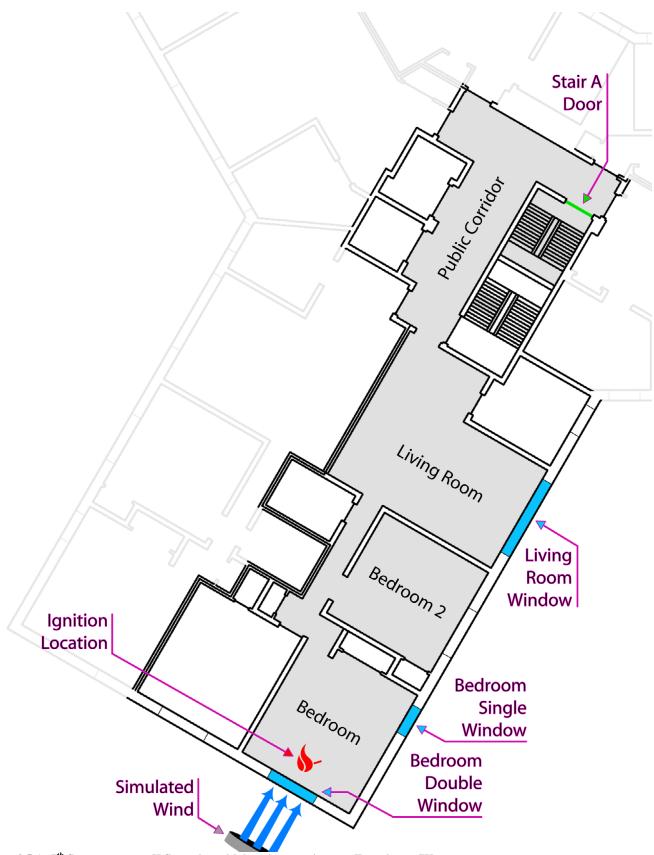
7<sup>th</sup> floor apartment K floor plan with locations pertinent to Experiment 7K
